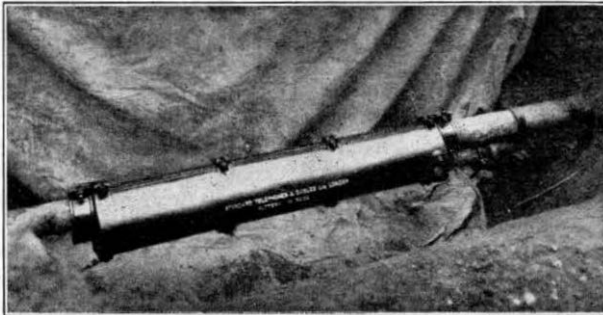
PROTECTION BOX AND TAIL CABLE IN POSITION AT BALANCING JOINT.
